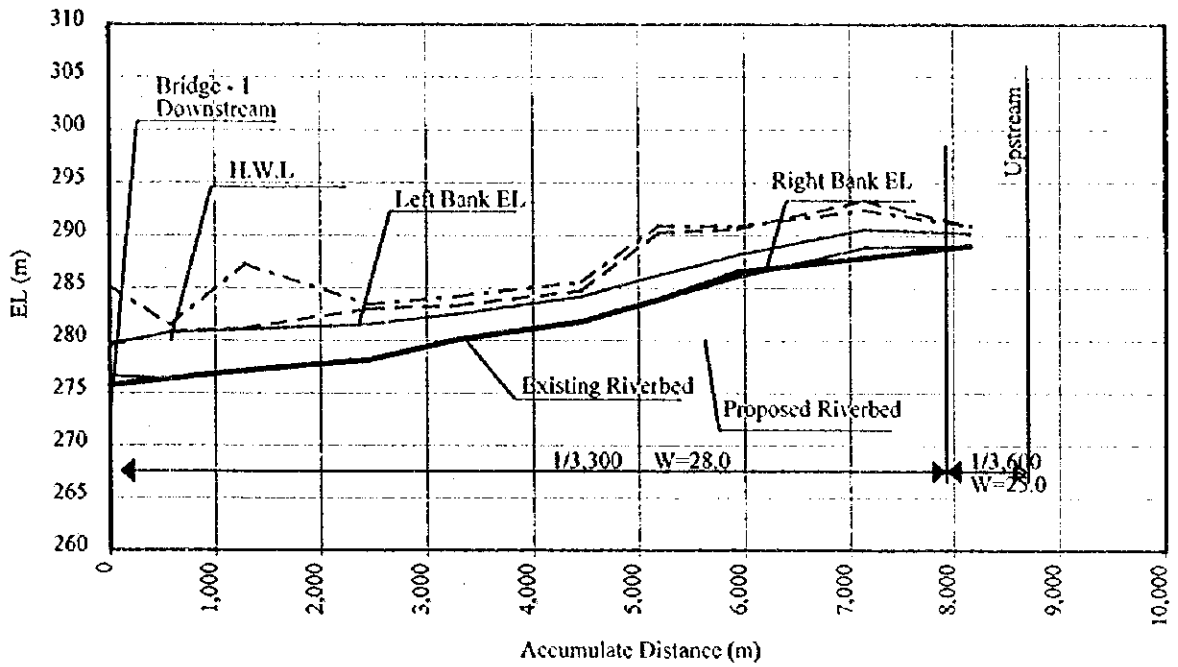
(3) LONGITUDINAL PROFILE OF DRAINAGE IMPROVEMENT
